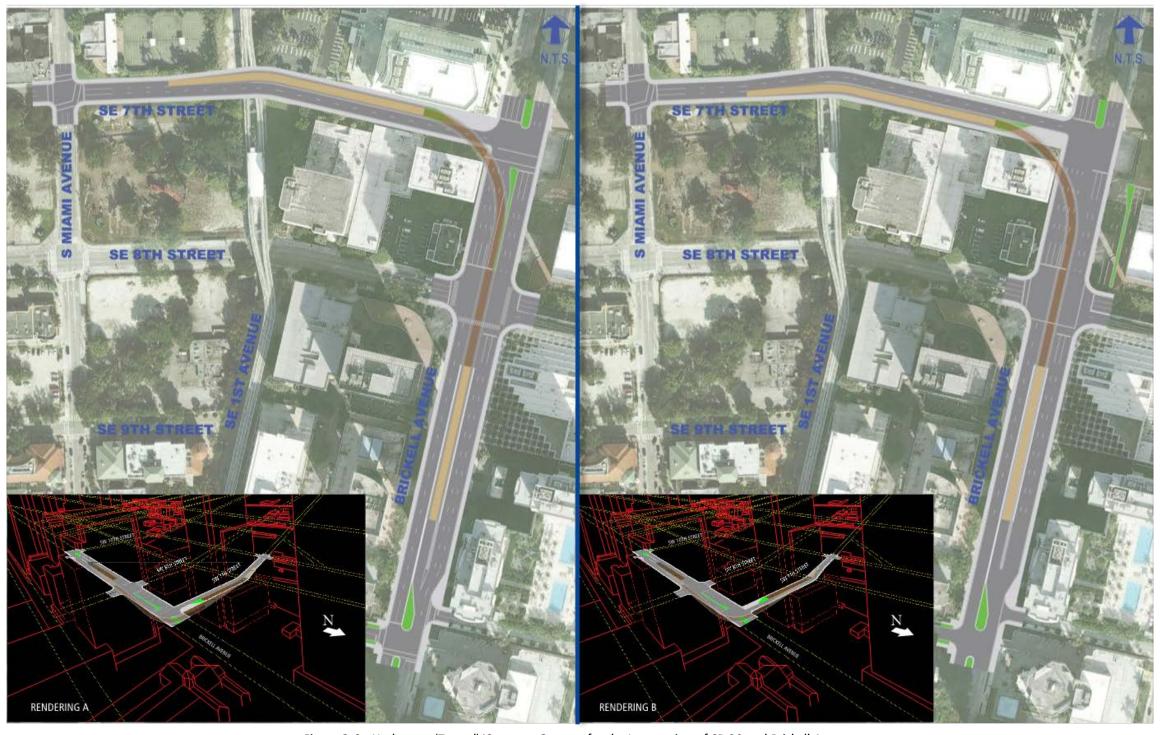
Underpass (Tunnel)/Overpass Concept for the Intersection of SR 90 and Brickell Avenue
